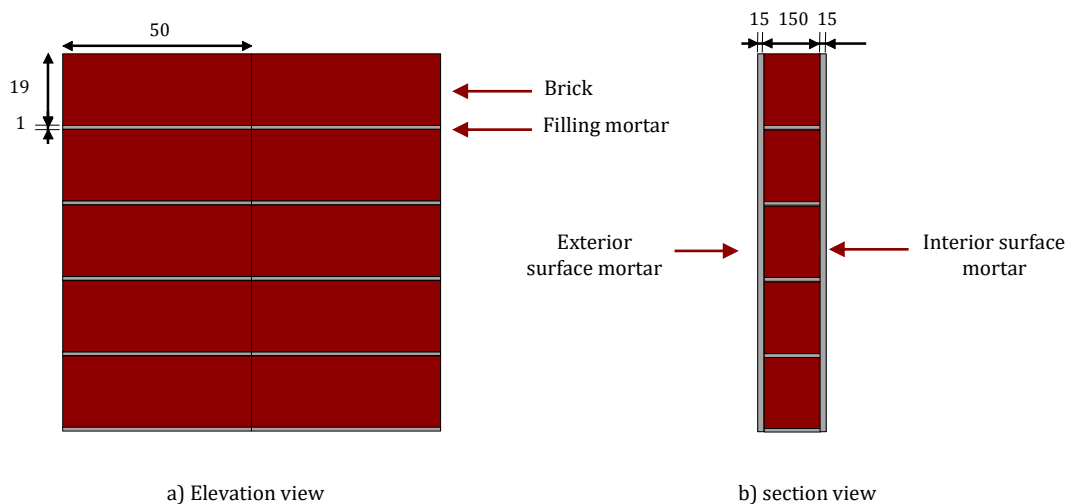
a) Elevation and b) Section views of brick wall structure (all dimensions are in mm)
